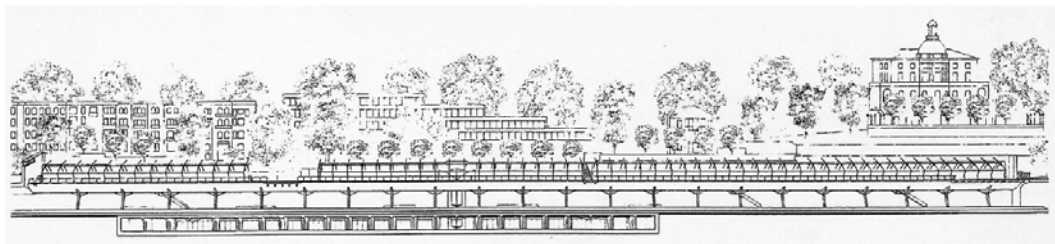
Stadelhofen Railway Station \_ longitudinal section
